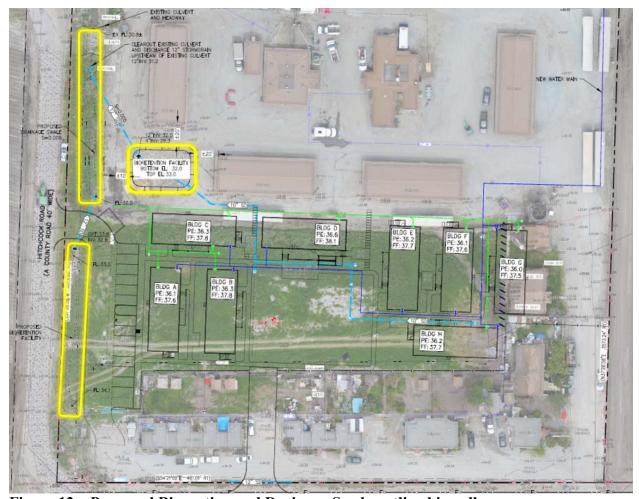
Proposed Biorention and Drainage Swale outlined in yellow
